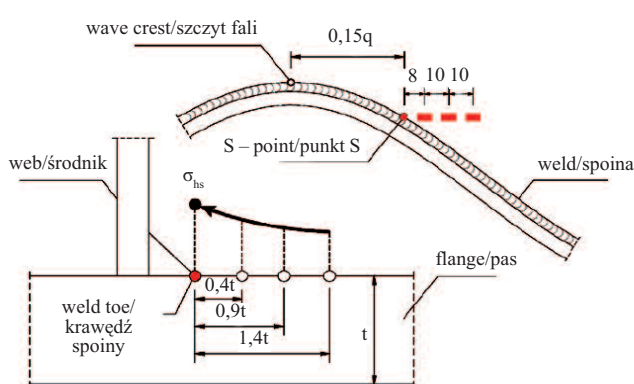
Positioning of strain gauges for measuring hot-spot stresses near the flange – web weld toe in the tension flange
